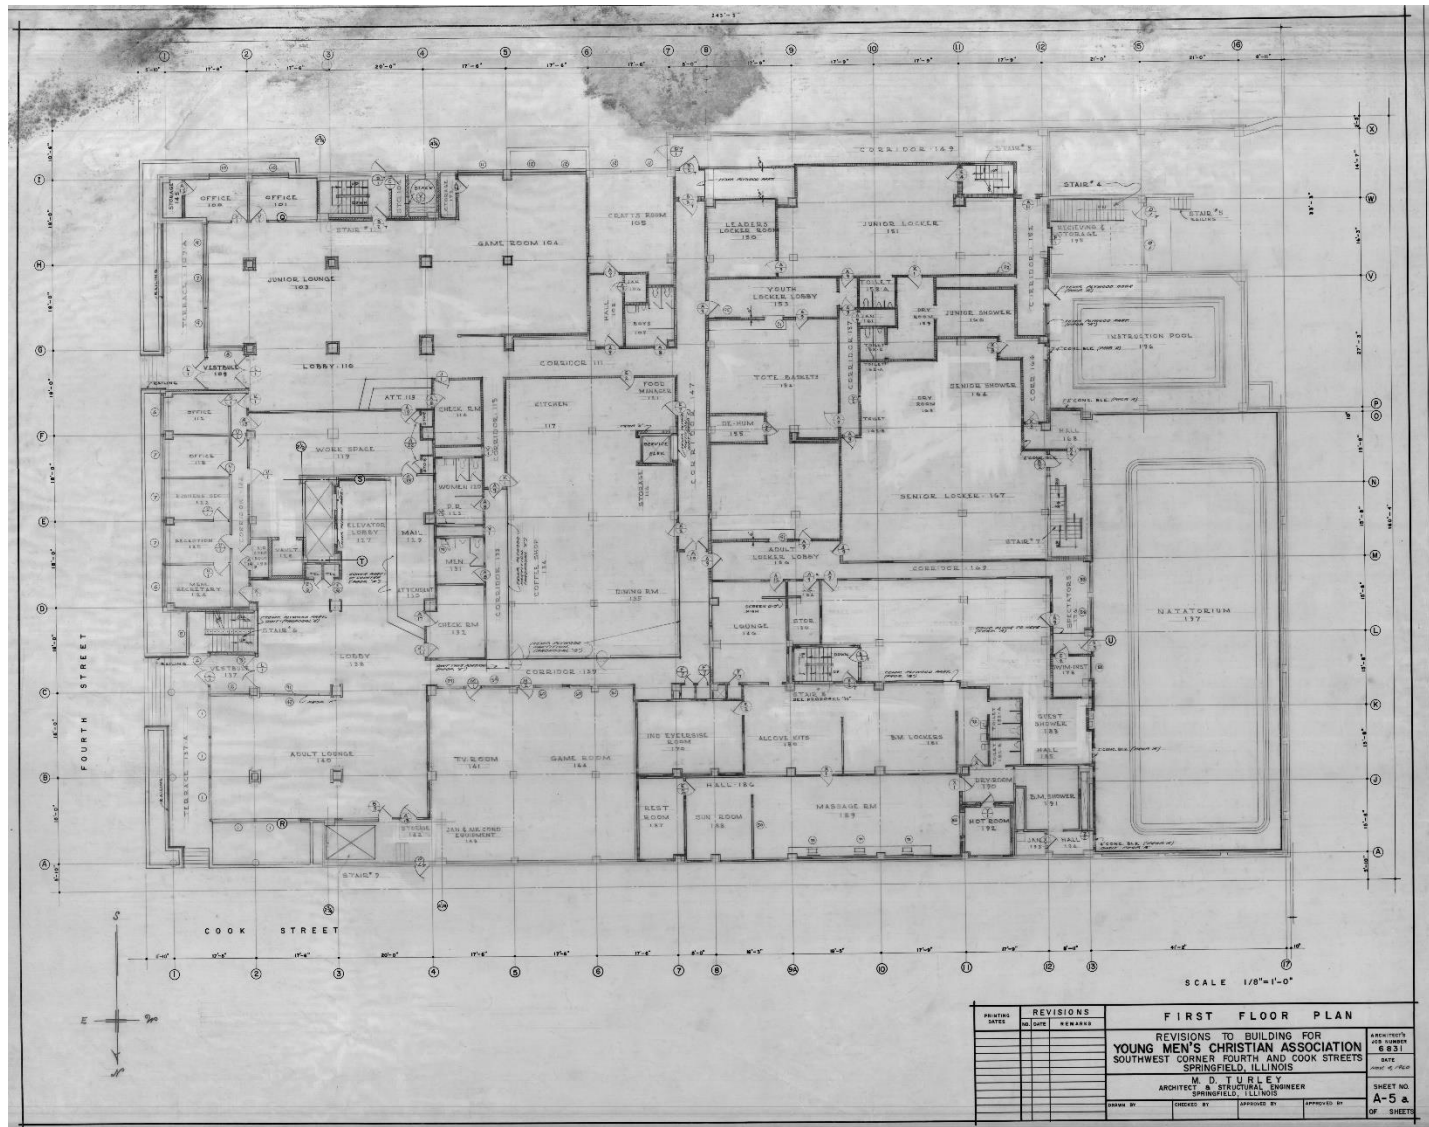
First Floor Plan, Revisions to Building for Young Men's Christian Association (Turley 1960: Sheet No. A-5a) [November 4, 1960].
